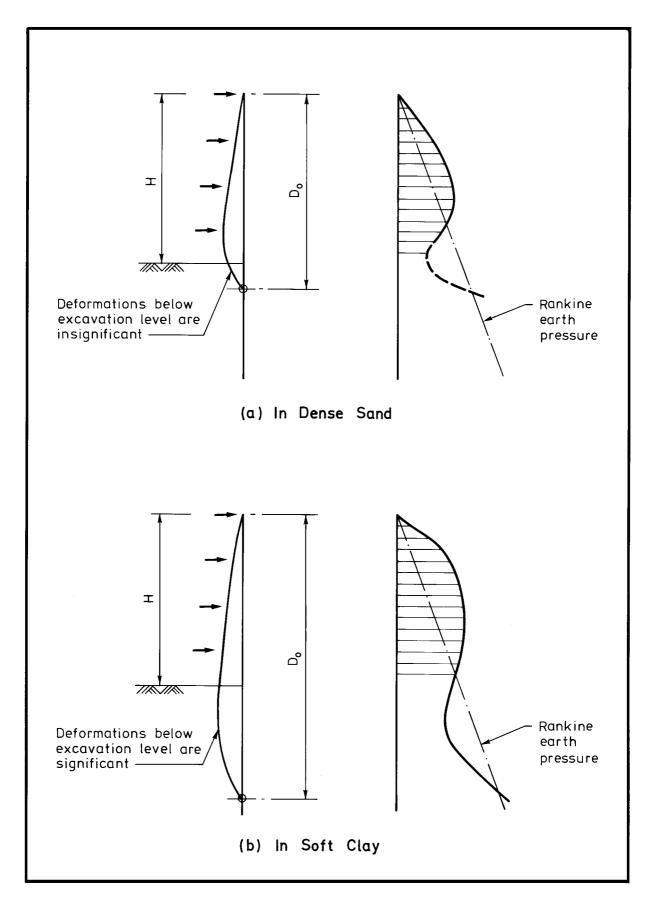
Deflection of a Sheet Pile Wall and Re-distribution of Active Earth Pressure (Bjerrum et al, 1972)
